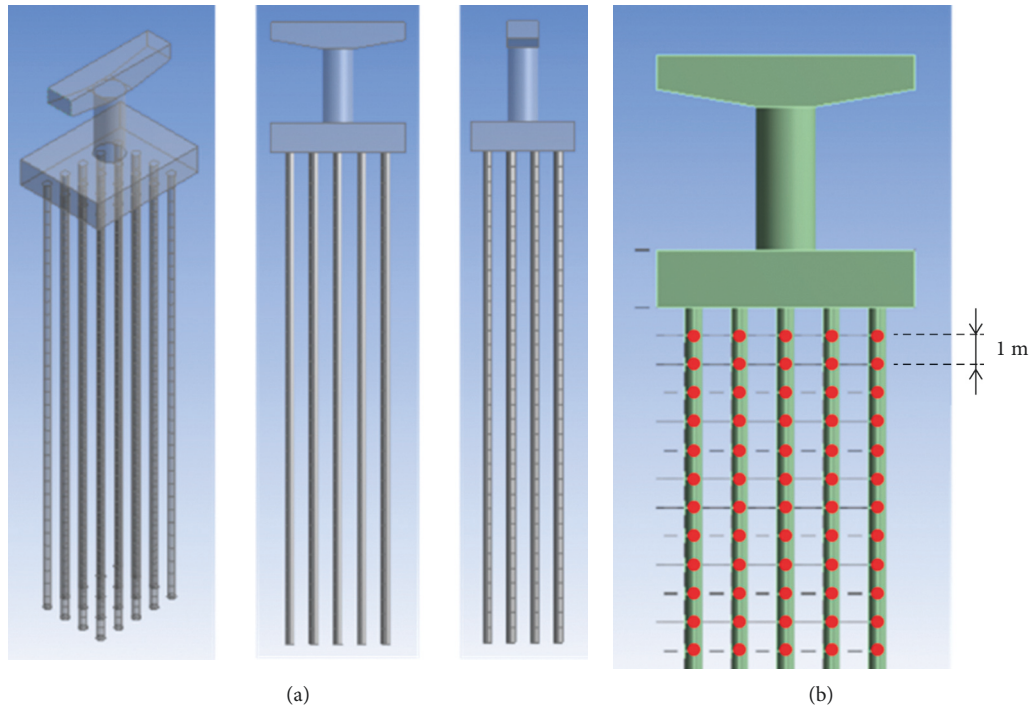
Numerical model of the Shi-Bin Bridge. (a) Column and piles. (b) Arrangement of soil springs.
